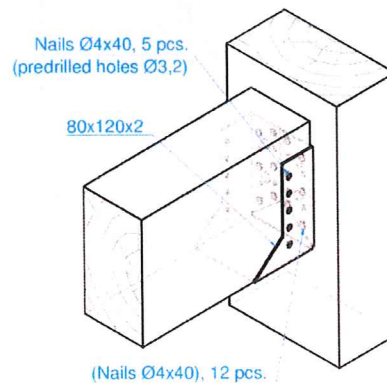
Number and position of nails in the timber beam to timber column connection with the joist hanger 80×120×2 with interior flanges. Position of nails is symmetrical in both sides.
